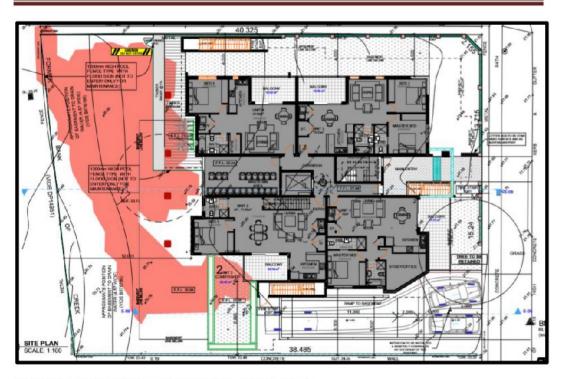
Extract of site plan (Source: Archi build International P/L, 2019)
